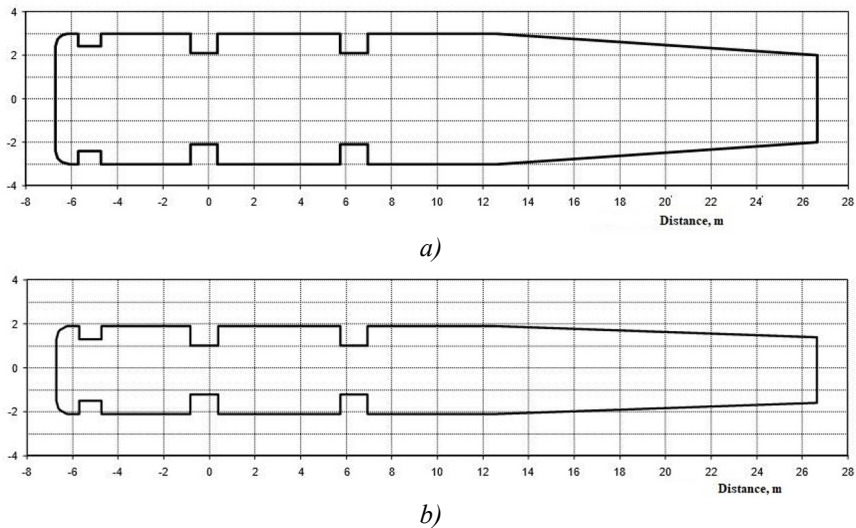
Cross-section of separating piers: a) 6.0 m thickness; b) 4.0 m thickness
